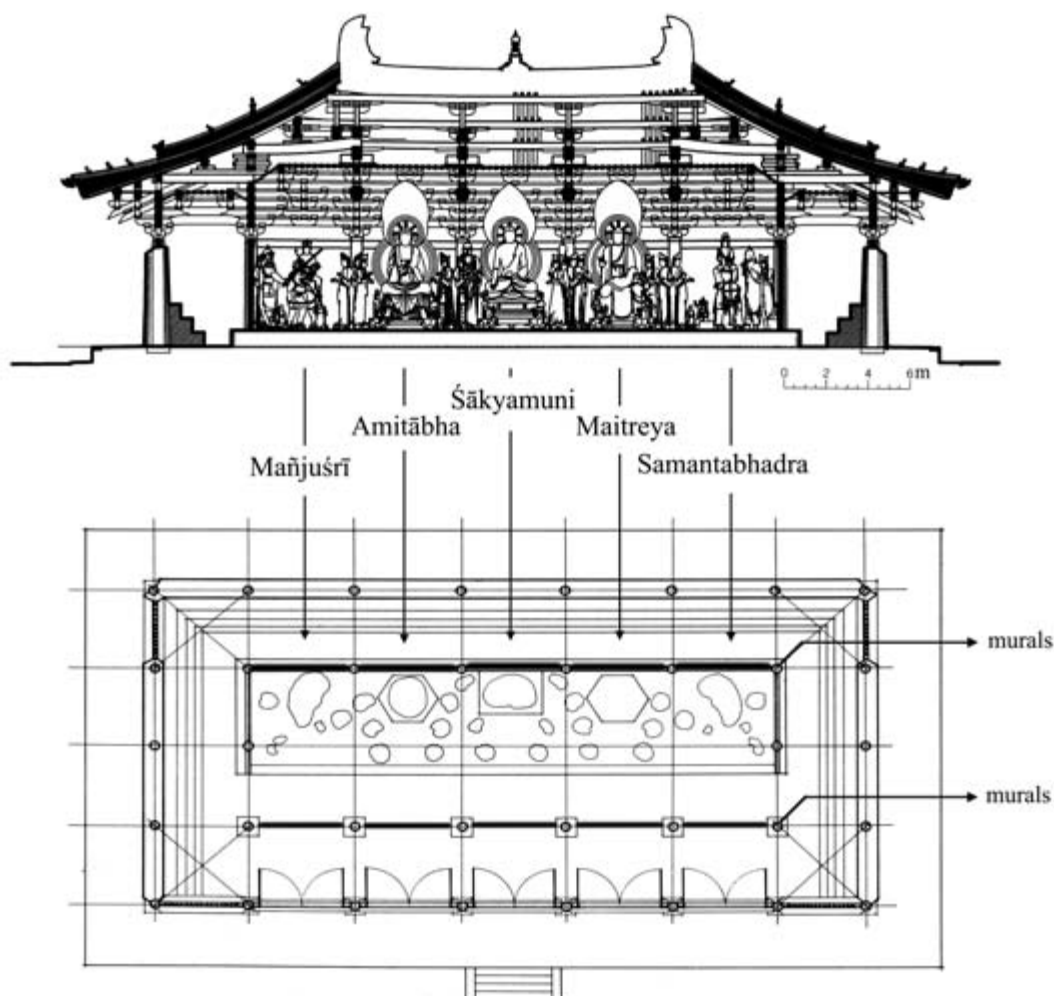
Section and floor plan of the Great Buddha Hall, Foguang Monastery, indicating the five major enshrined icons. Murals are visible on the board above architrave (*gongyan bi*), between brackets on the first row of interior columns and above the back screen of the altar. After Fu Xinian, *Liangjin, Nanbeichao, Sui-Tang, Wudai jianzhu*, fig. 3.7.21 (section); Fu Xinian, “Wutaishan Foguangsi jianzhu,” fig. 2 (floor plan). Drawings courtesy of Fu Xinian.
